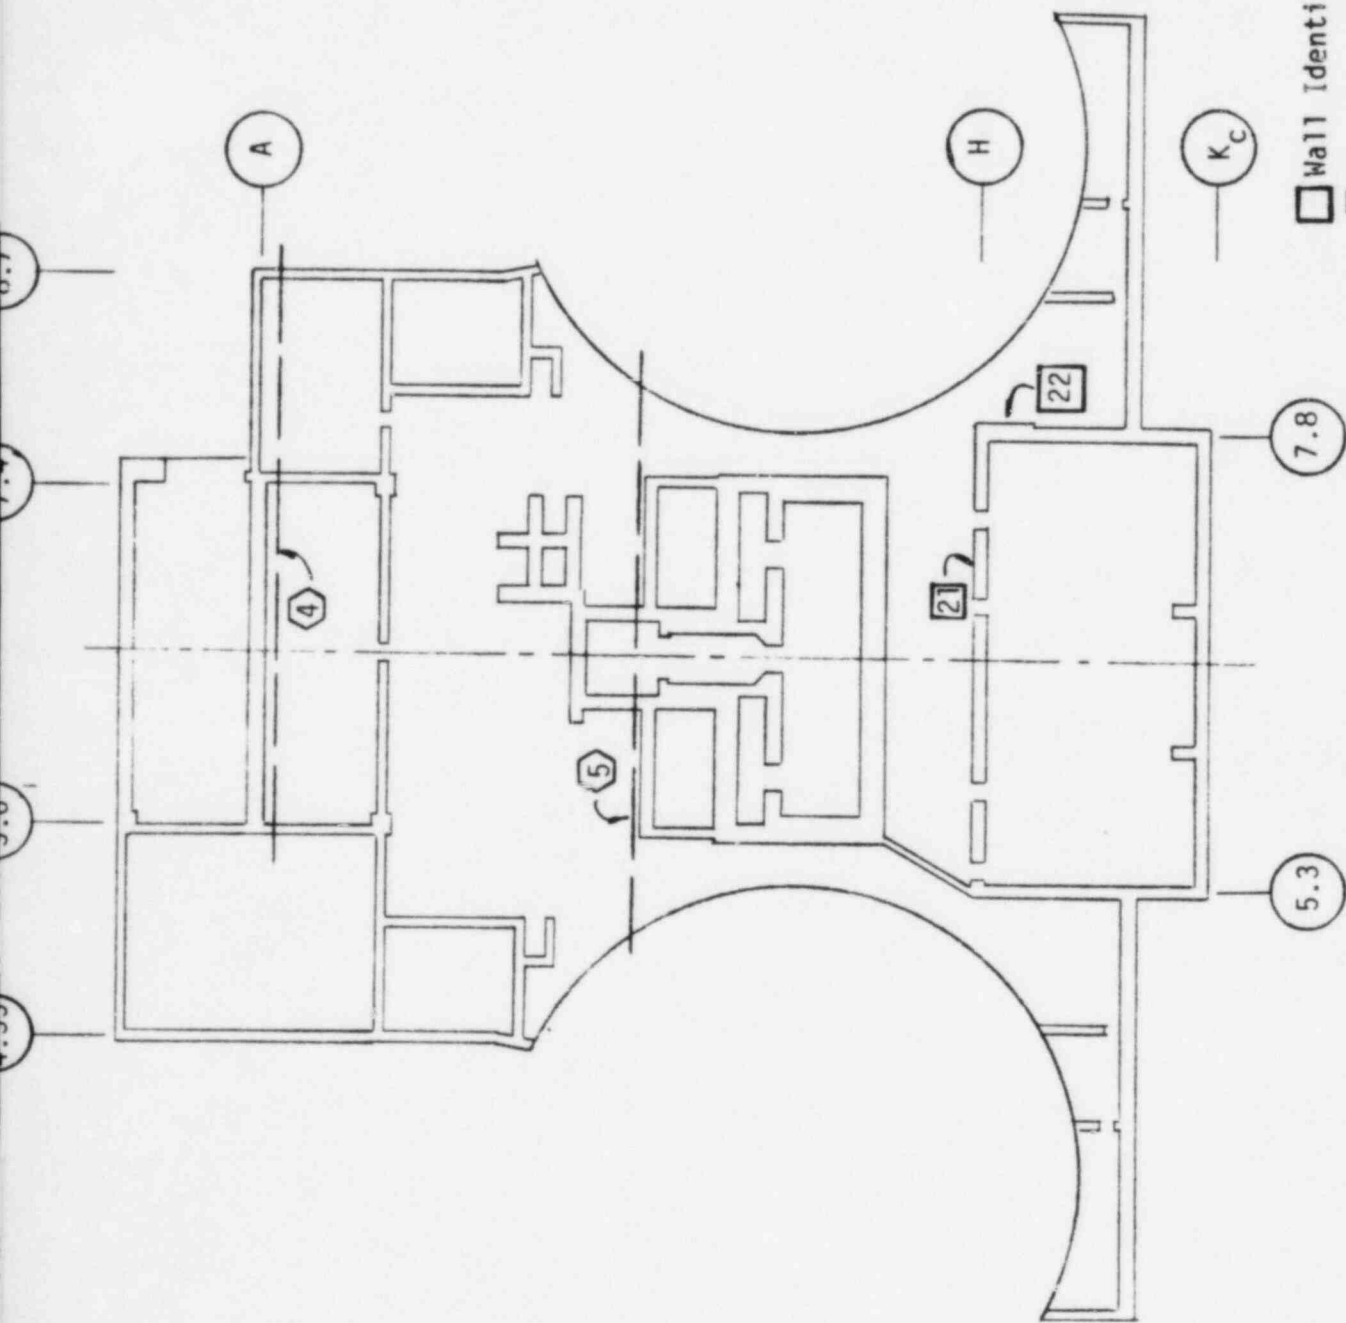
AUXILIARY BUILDING PLAN, ELEVATION 634'-6"
